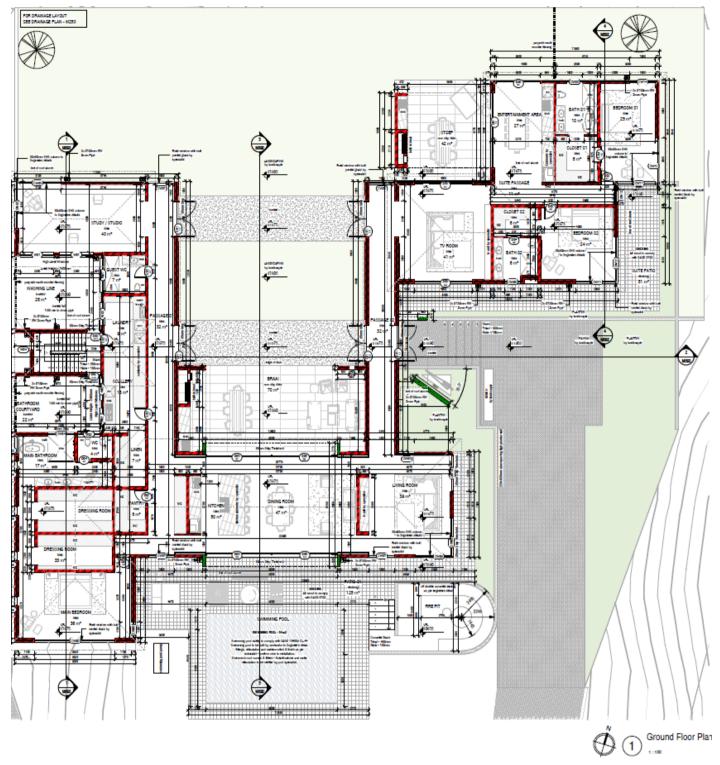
Ground Floor Plan (Mathews + associate architects, 2024)
